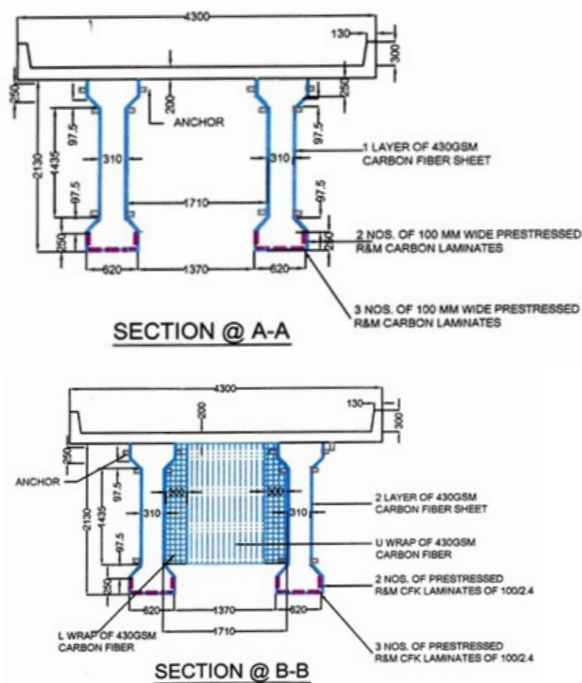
Sectional elevation of Ratlam railway bridge PSC I girders
